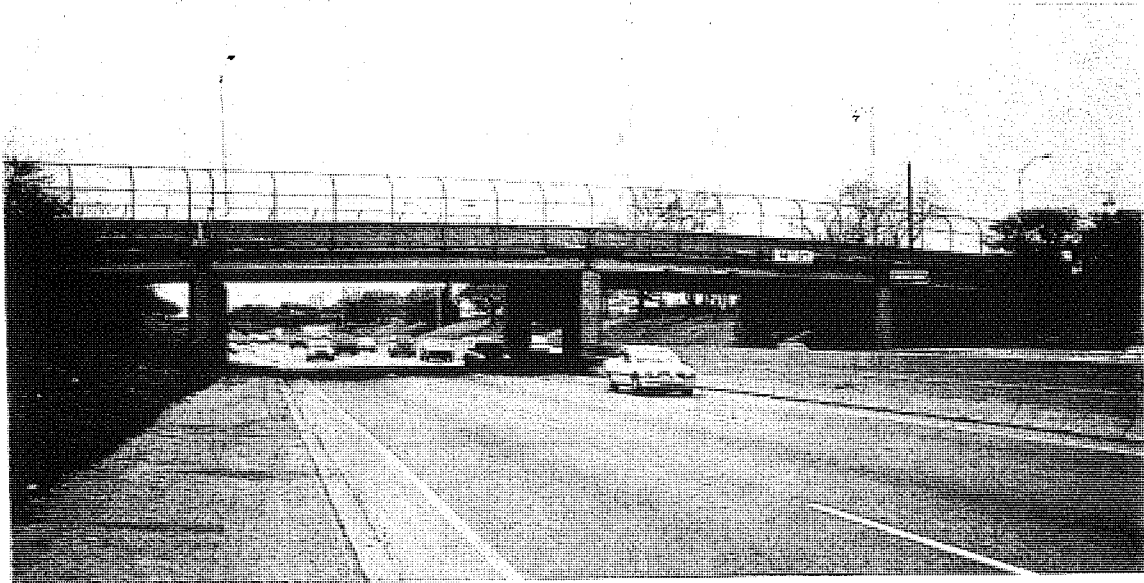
Bridge LA/I94, Lonyo Avenue Southbound over I-94 Westbound in Detroit. View and Side Elevation.
